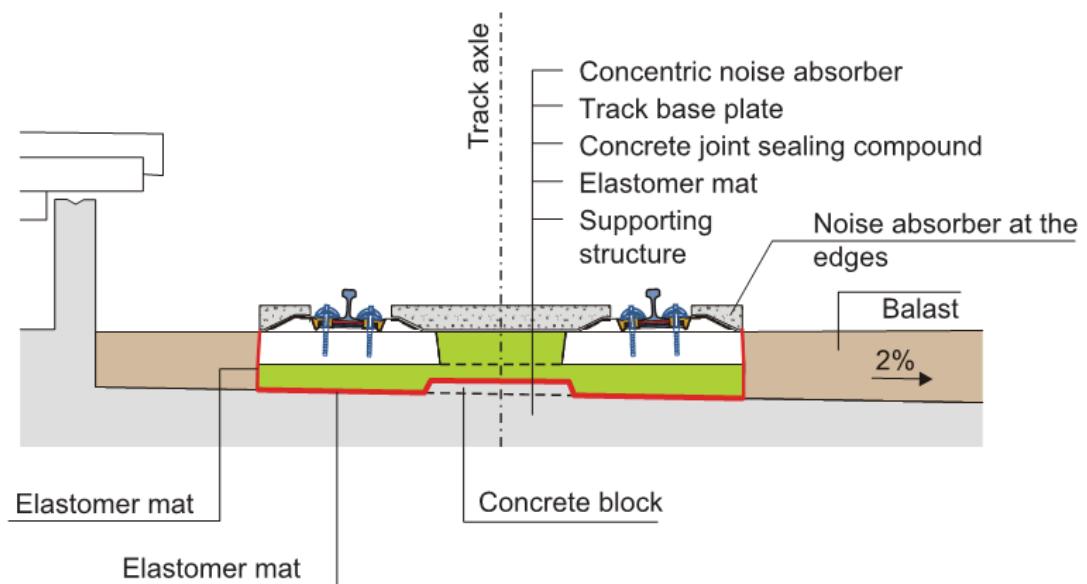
Floating slab track system on a bridge structure, (PORR Group, 2017).
